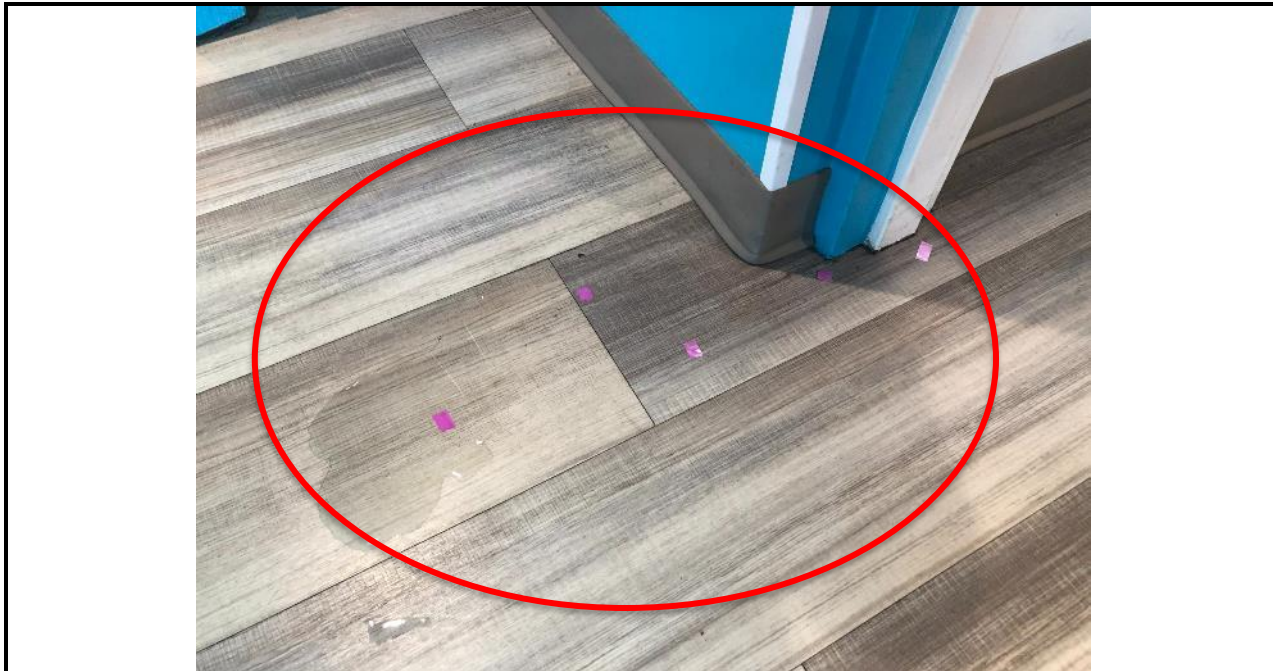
Test location #4 - water was visually observed and detected utilizing infrared thermography migrating from beneath the vinyl baseboard and collecting on the finished flooring at the corner between the bathroom hallway and the hallway leading towards the activity room 114.
